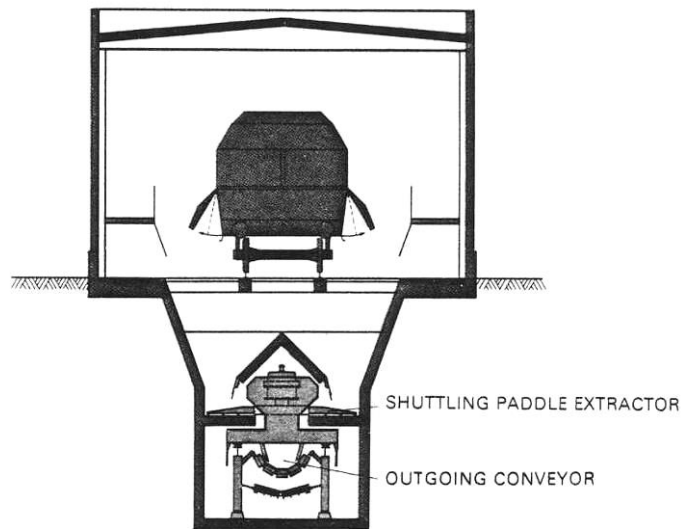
Reception bunker and bottom-discharging wagons, with a moving paddle wheel extractor at the bottom
